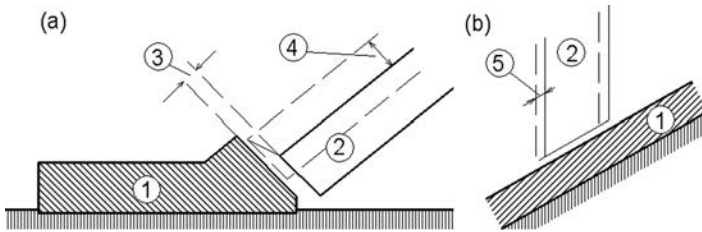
Displacement of the perimeter joint (after Pinto & Mori, 1988). (a) Cross-section; (b) longitudinal section. (1) Concrete plinth; (2) Concrete slab.
